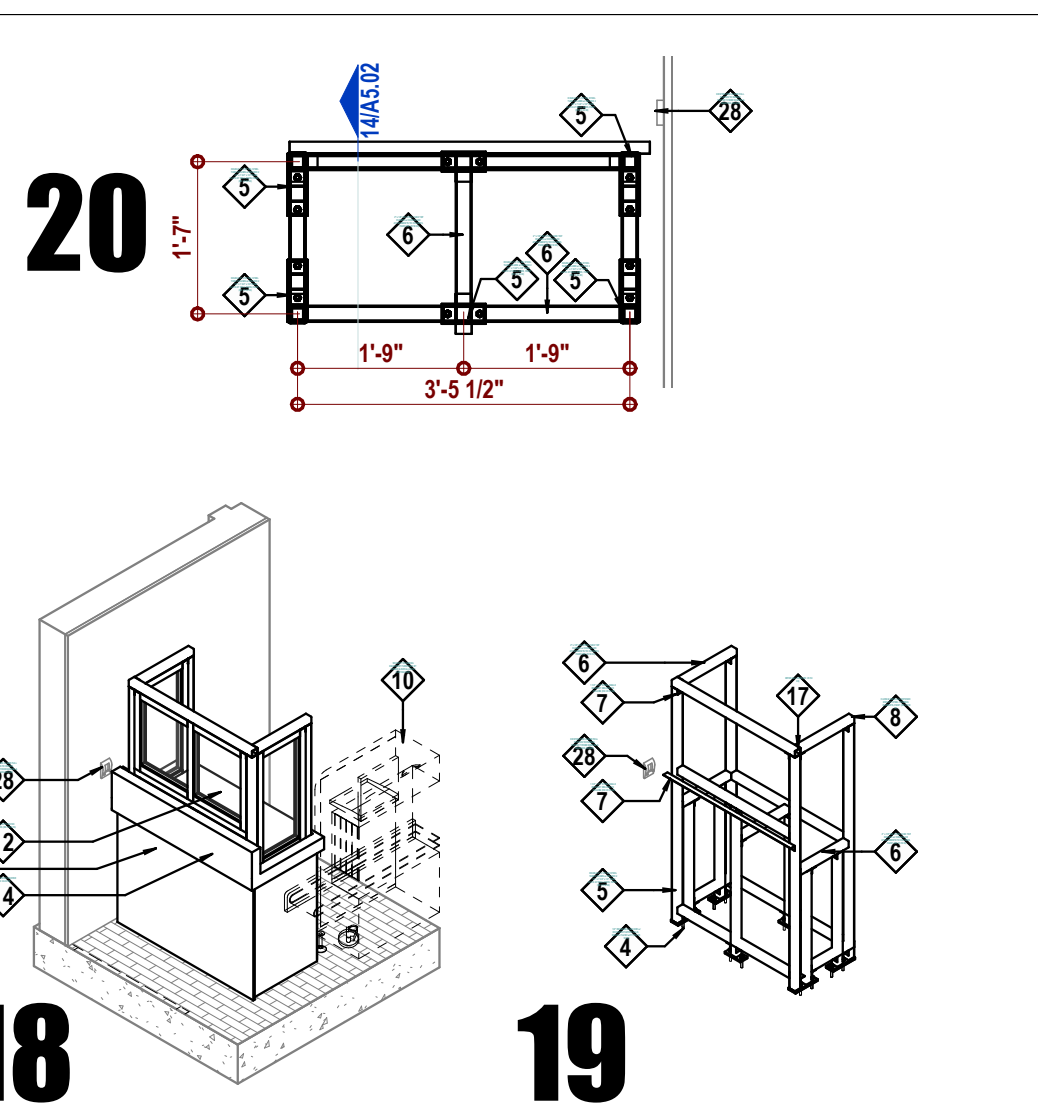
DETAILS AT SEMI-PERMANENT GUARD STATION
